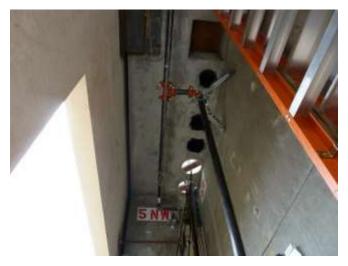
Seismic bracing on Floor 5 main feed pipe
